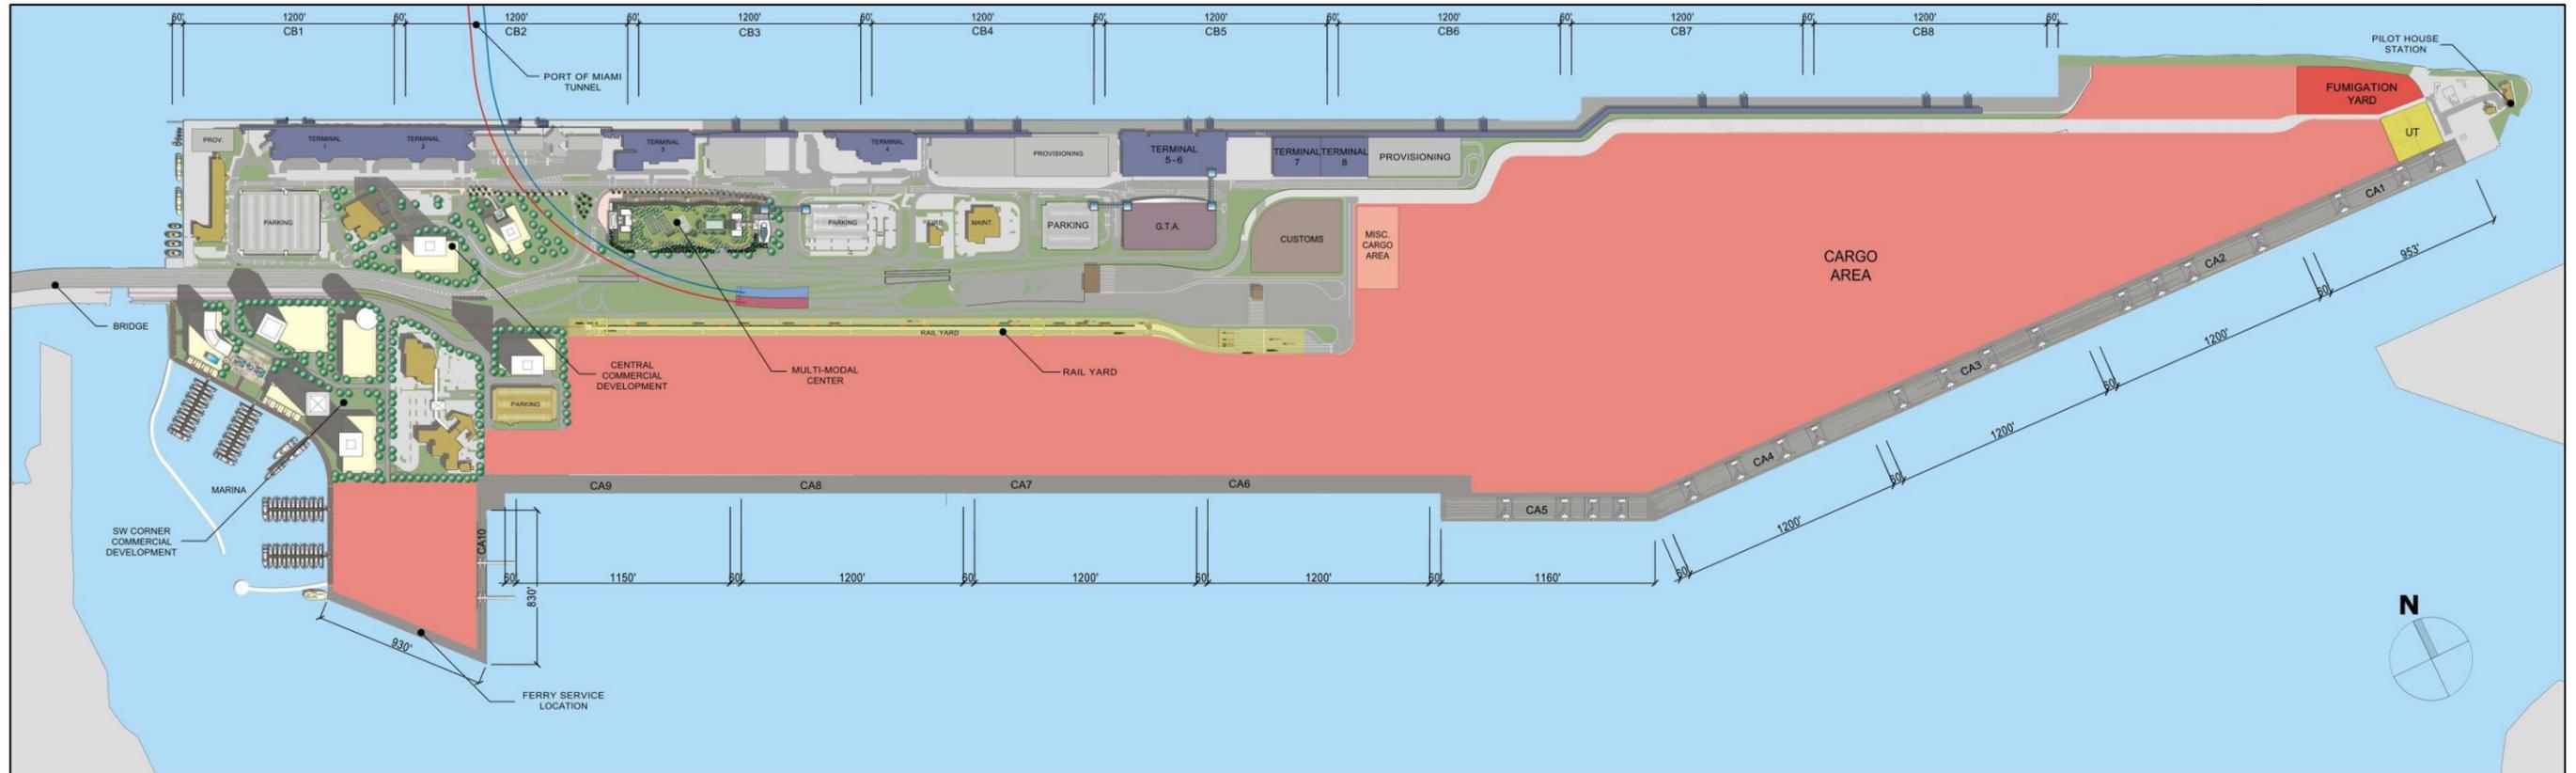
A: ALTERNATIVE CRUISE TERMINAL PLAN
